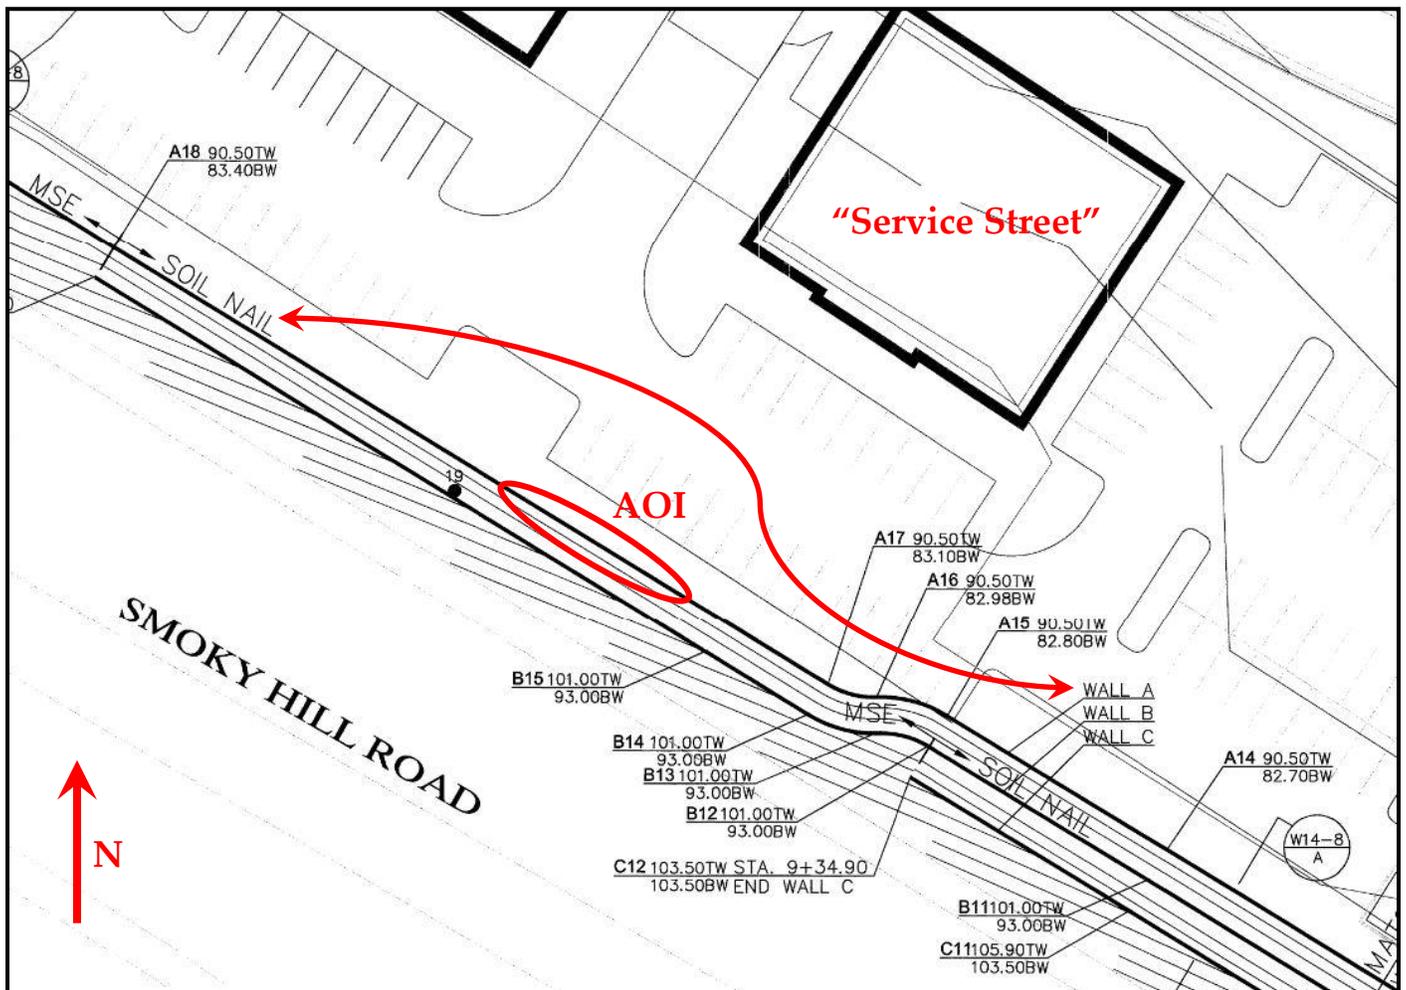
Excerpt from sheet W14-3 of Ground Engineering drawings showing area of interest; notated by Golden Forensics; note Wall A is a soil nail wall at AOI
